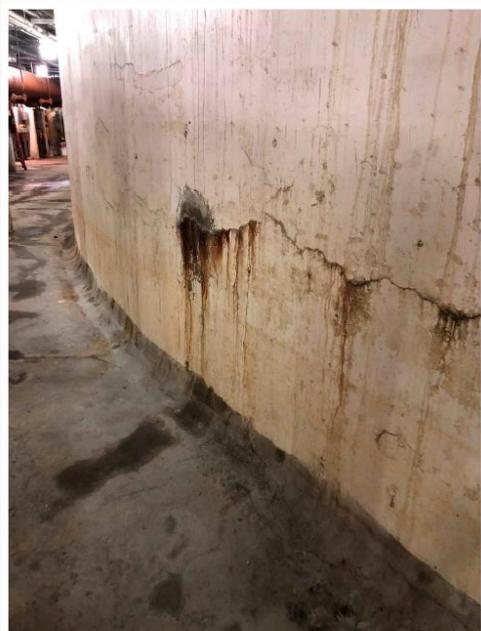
TYPICAL CRACK IN STT TANK WALL IN PIPE GALLERY
